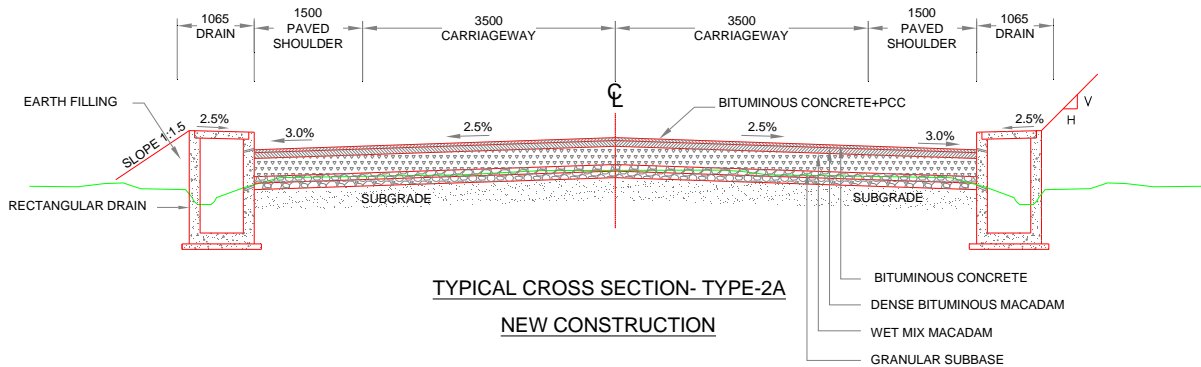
TYPICAL CROSS SECTION- TYPE-2A
